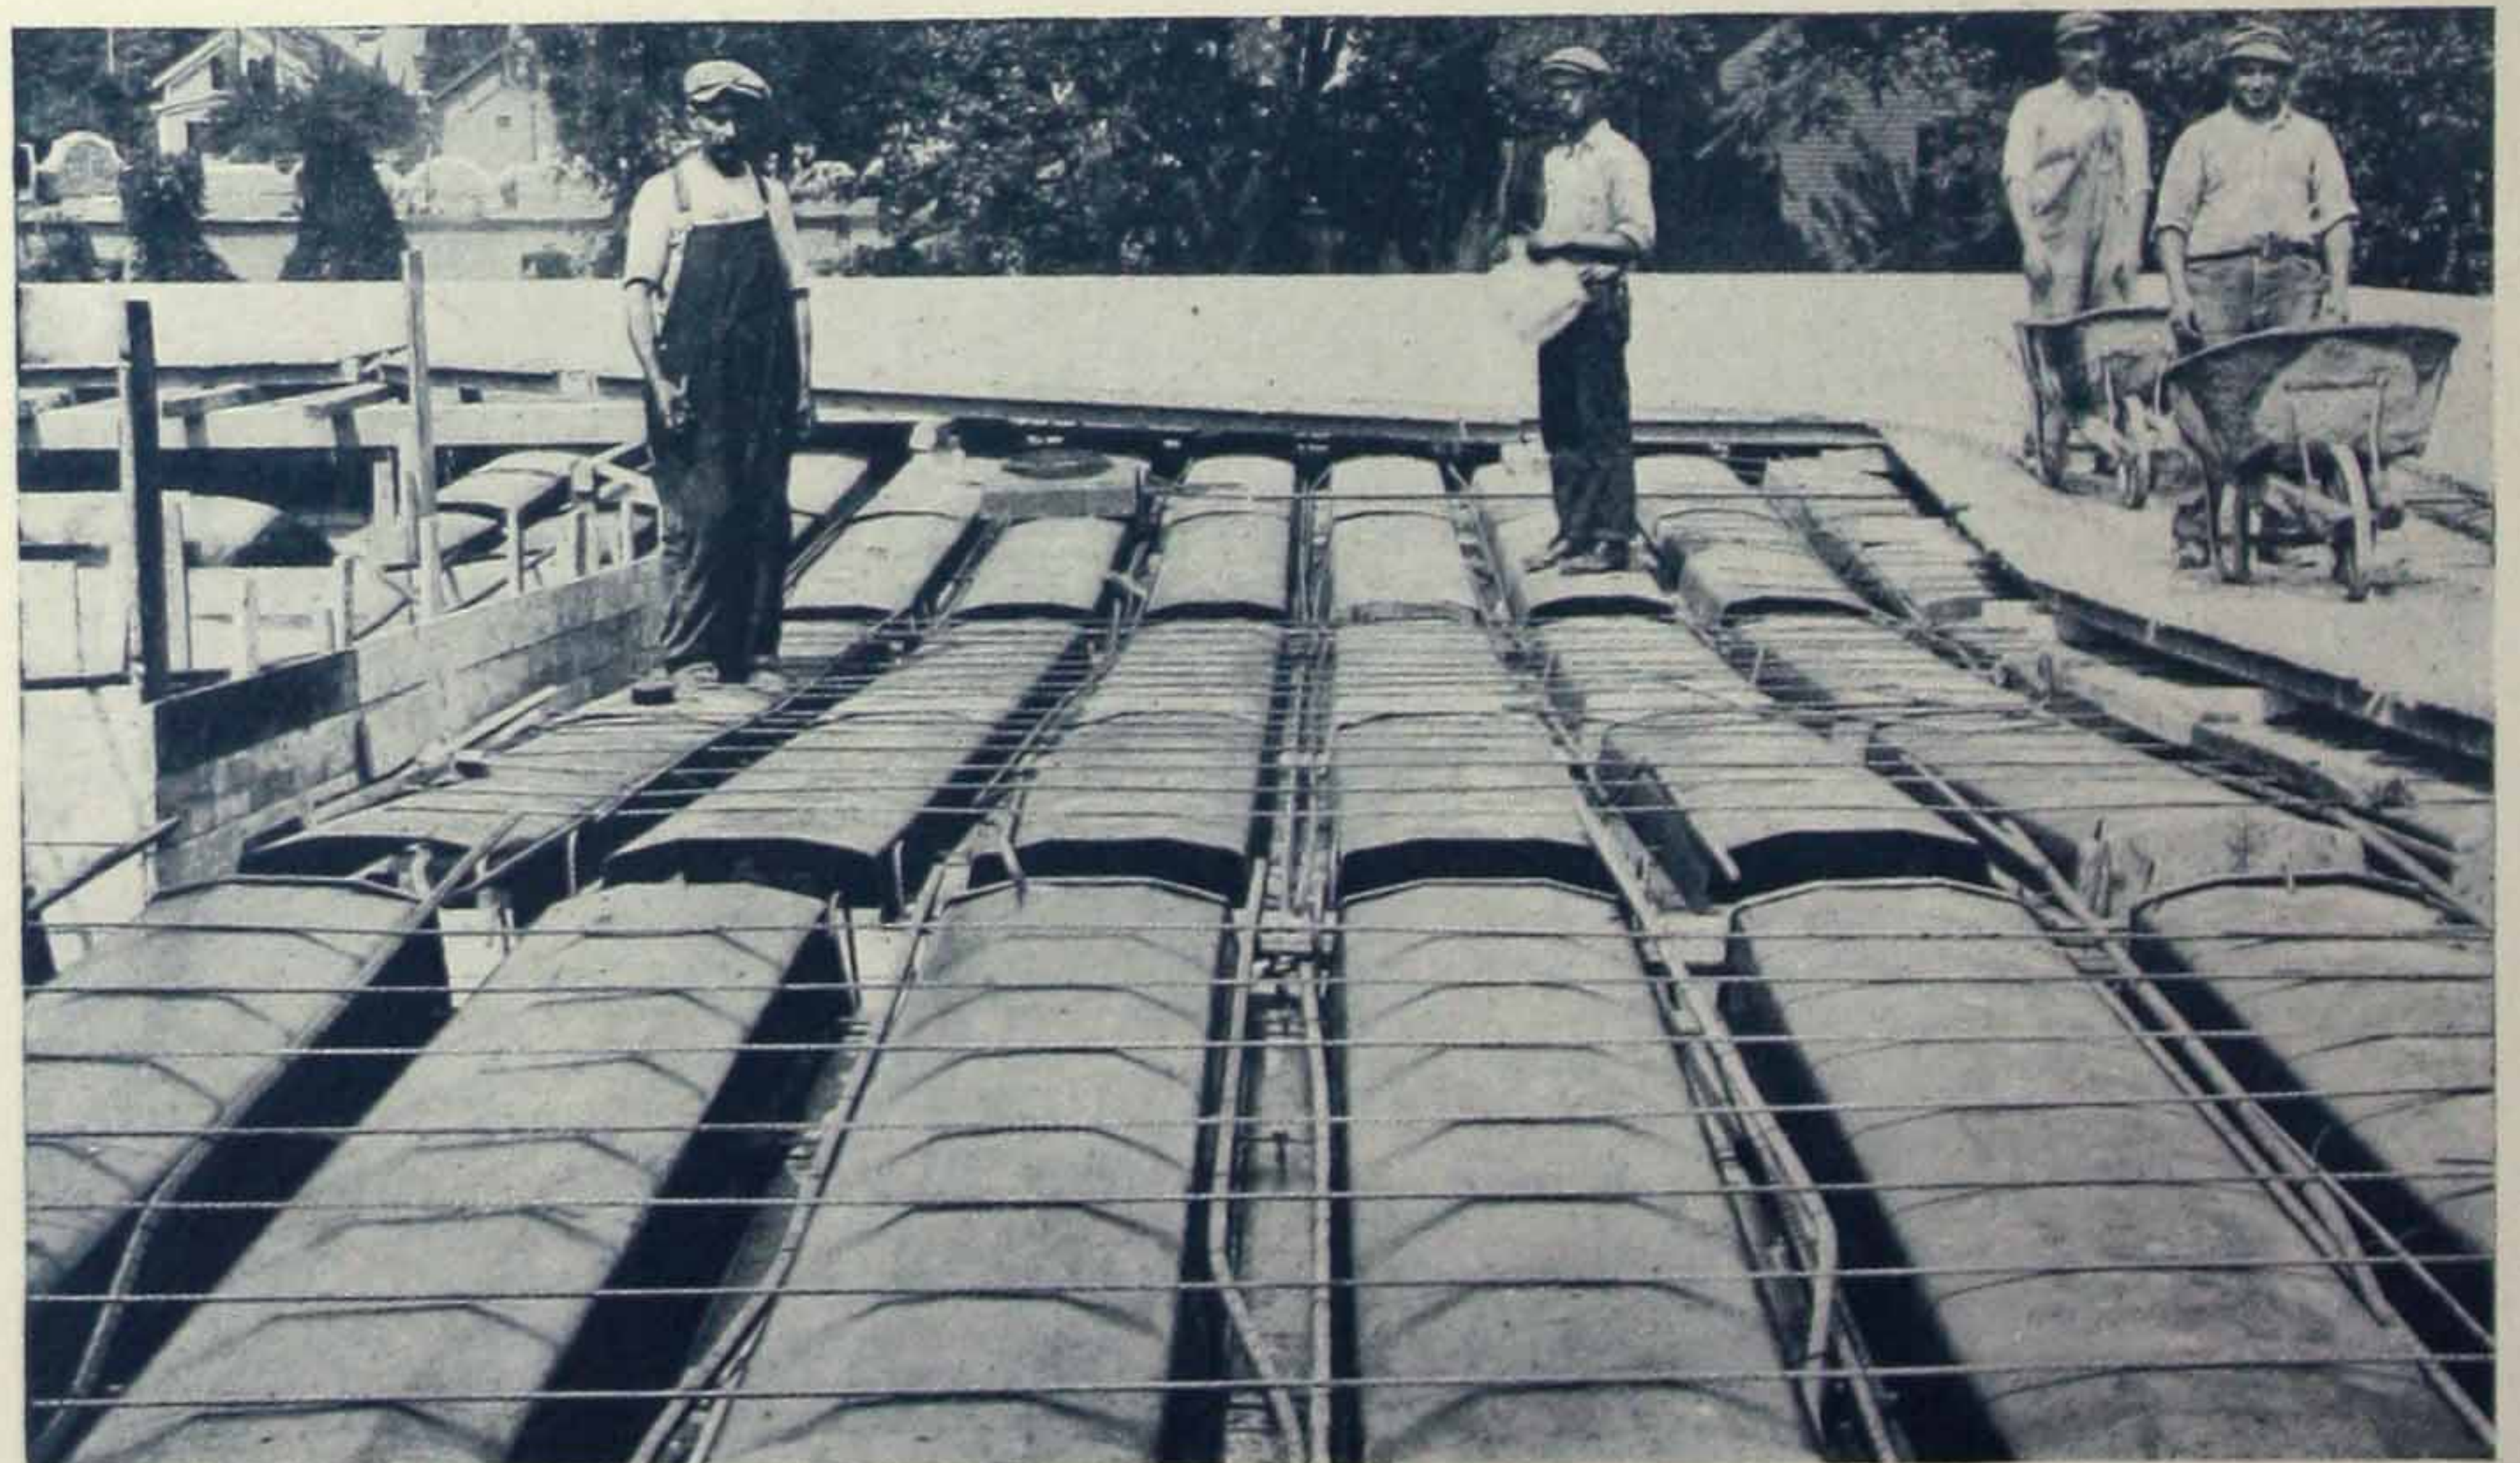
PLACING AND WIRING THE REINFORCEMENT (THE OLD WAY)
